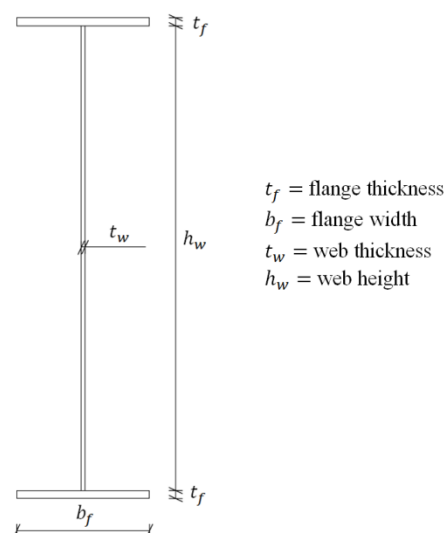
Geometry of the cross-section of the studied girder with flat web.
